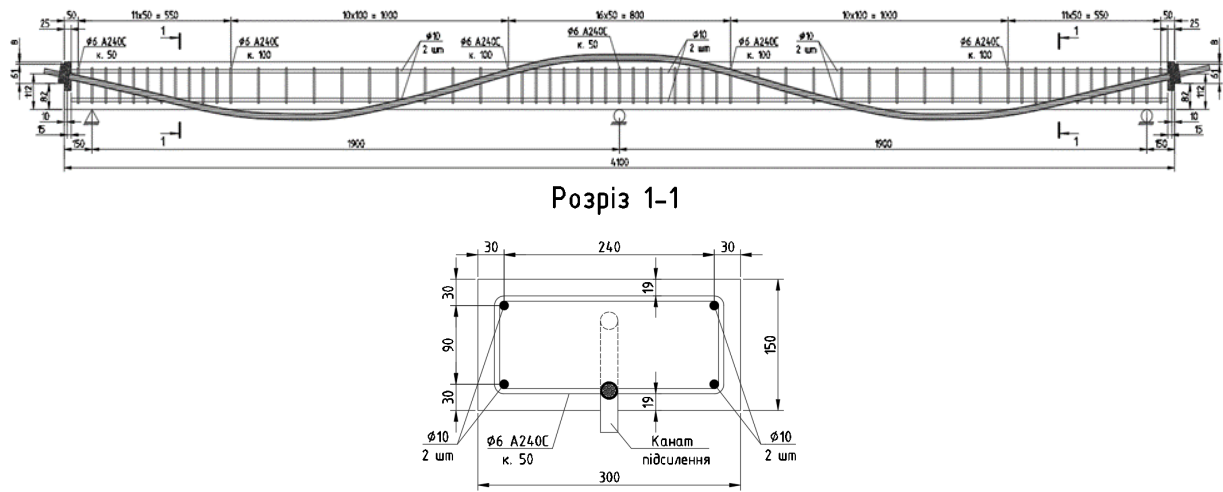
Schematic diagram of reinforcement of reinforced single-span beams B-1.2 series 1
